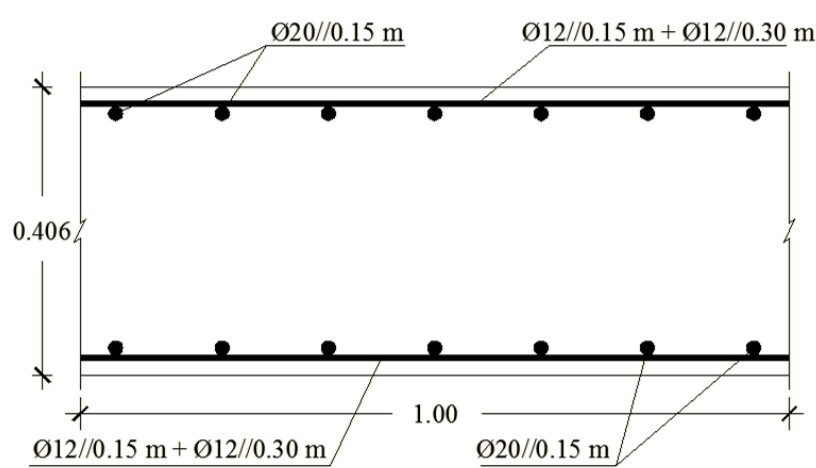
Transverse cross section of the upper deck slab and reinforcement layout
